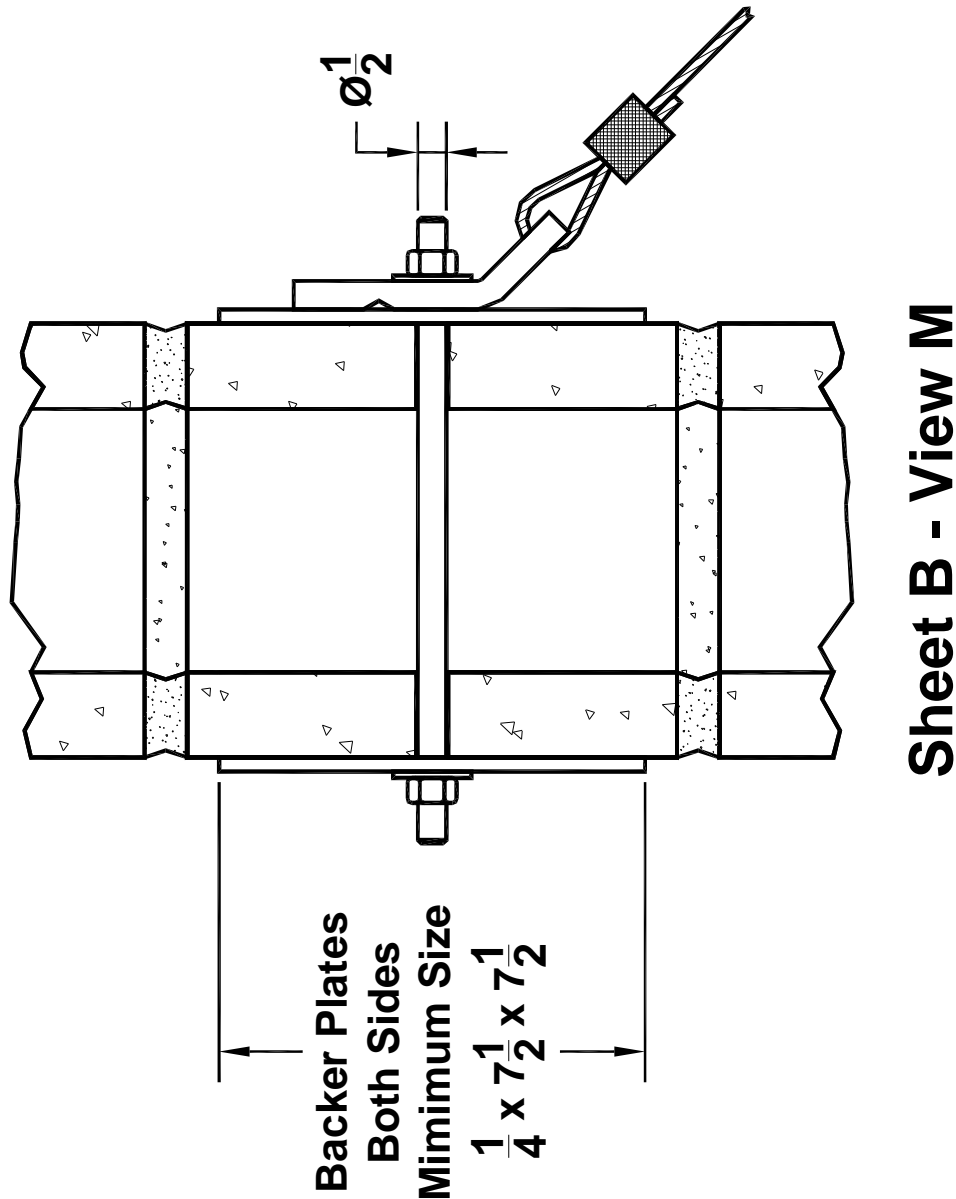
; KSCA Through Bolt Attachment to a Hollow CMU Wall
